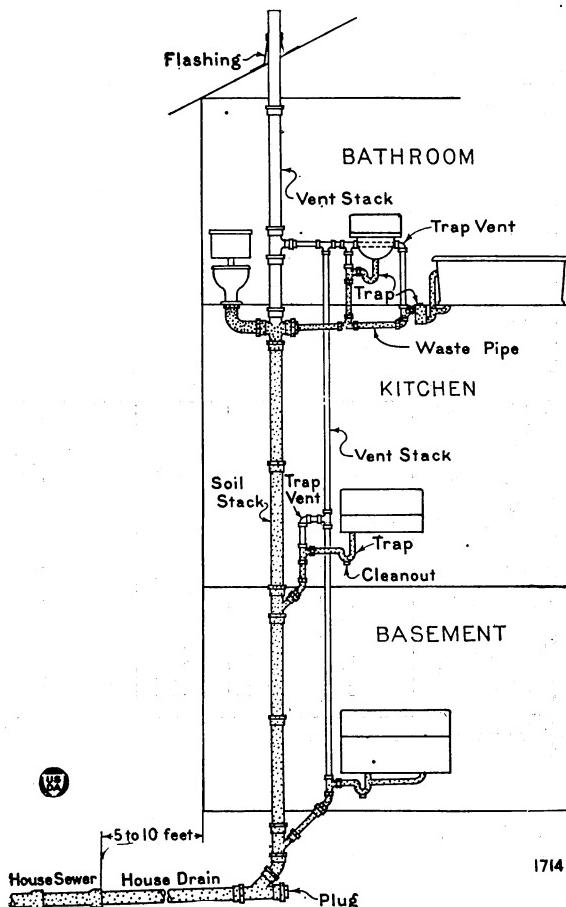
A typical 5-fixture job. Drainage pipes are stippled and vent pipes are outlined
